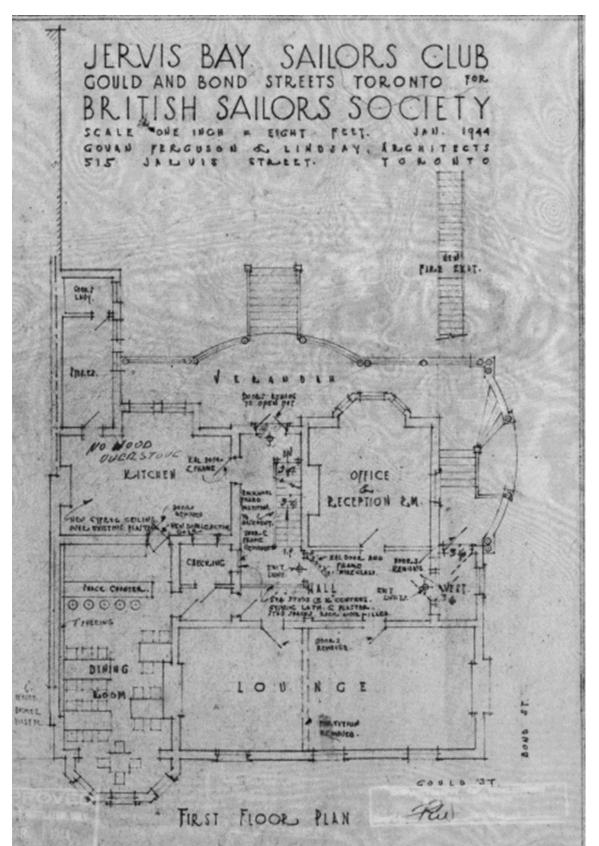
Building Records, Toronto and East York, Building Records Files No. 80142 (1944). 137 Bond Street, First Floor Plan.
